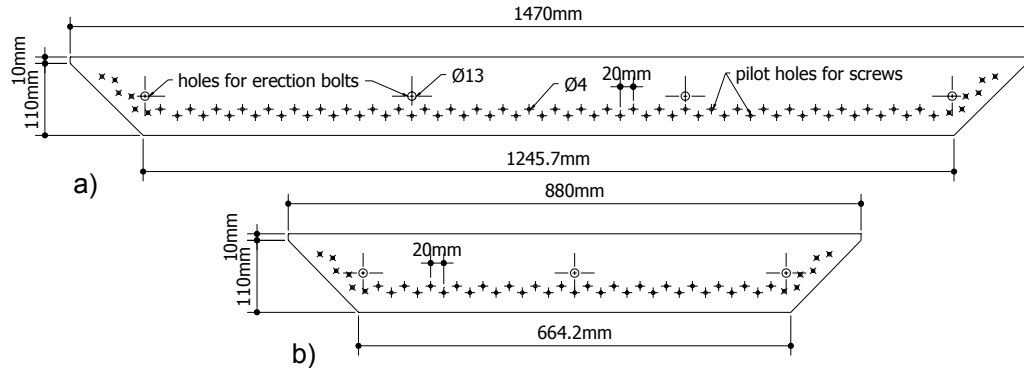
Fish Plates Details, a) for beams, b) for columns
